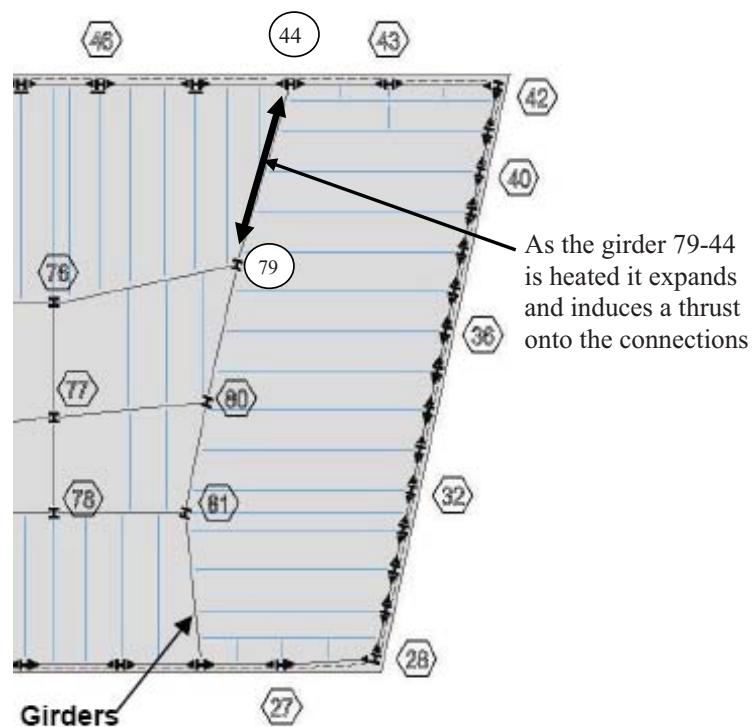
Expansion of girder 79-44 in the early stages of the fire
